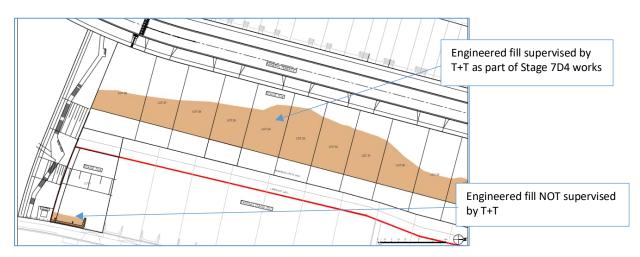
Extract from CJ Arms drawing titled 'Fill Layout Plan', Project No.15006, Drawing No.9920, Sheet 2
